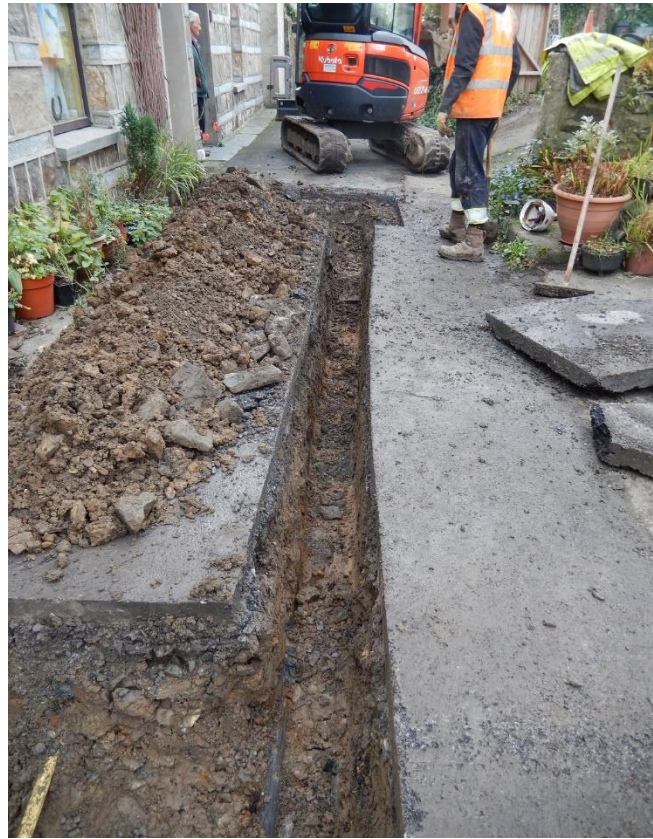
Trench 1: the central joint-hole, after excavation, from southwest.
